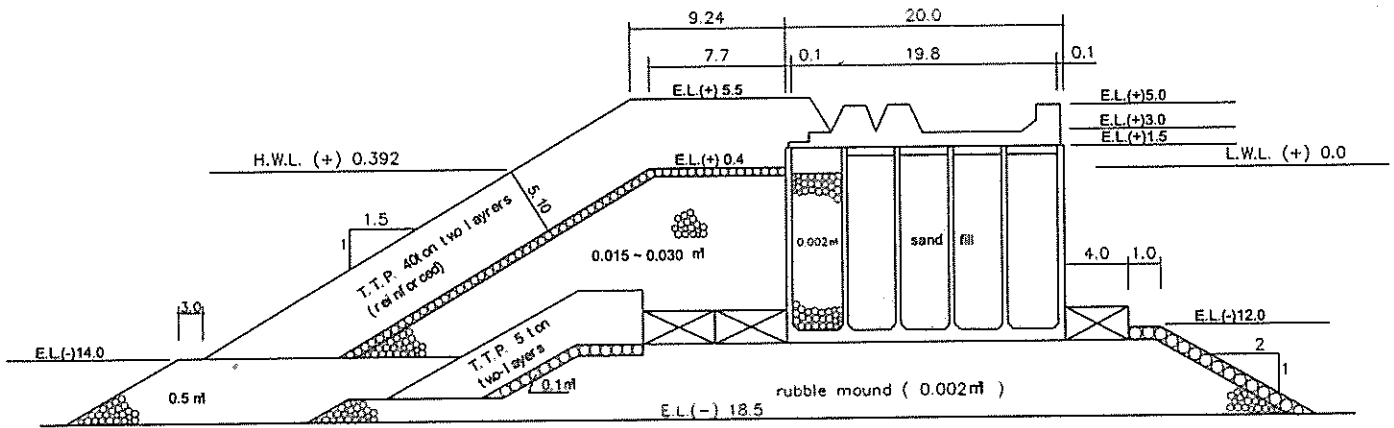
Cross-section of Sec. 11 after reinforcement (unit: m).
